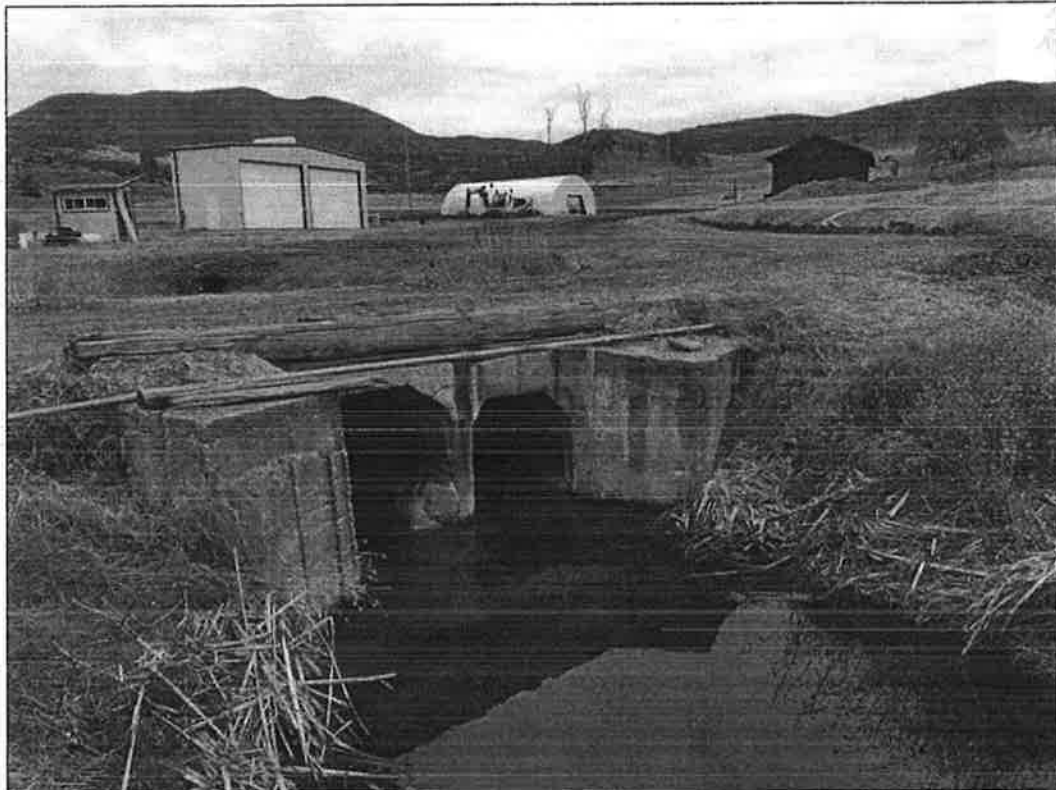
PHOTOGRAPH OF BRIDGE LOOKING DOWNSTREAM
